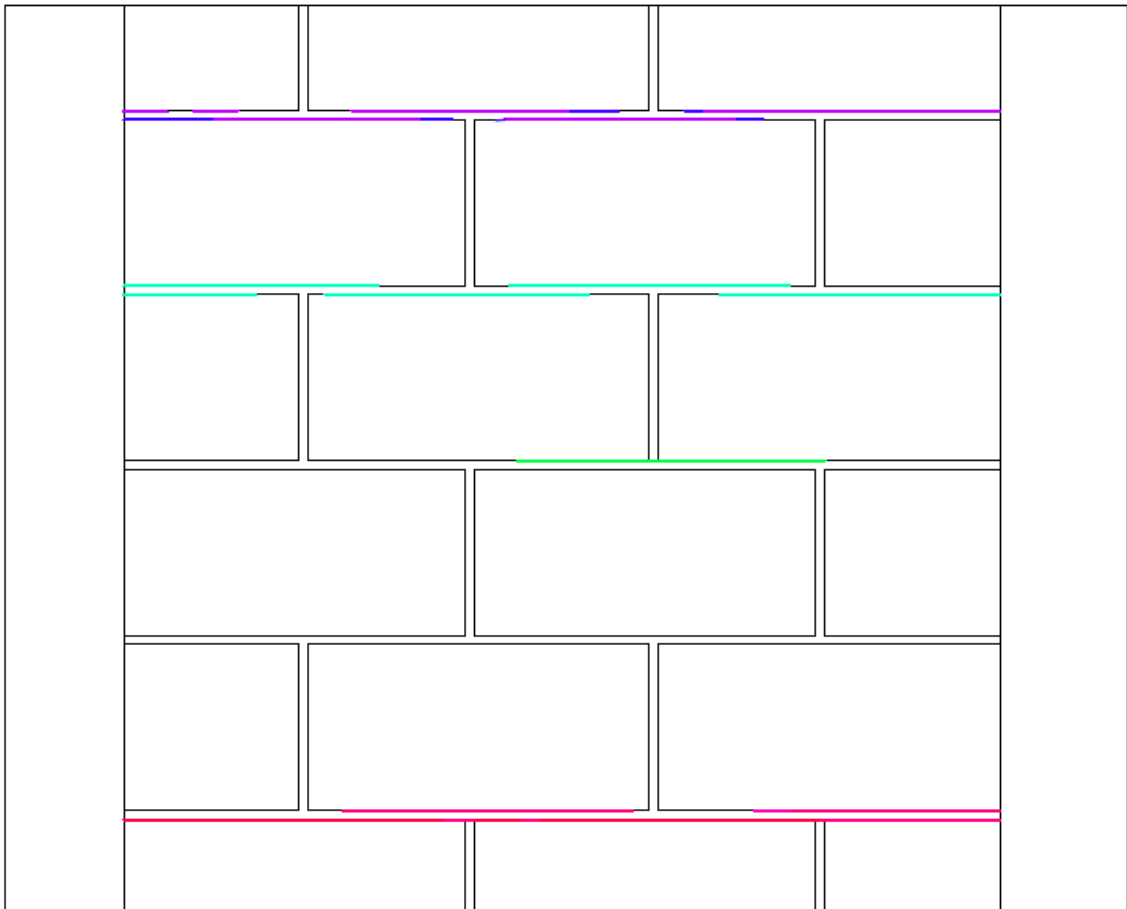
Close-up of Crack Pattern of B-2 3m Wall
